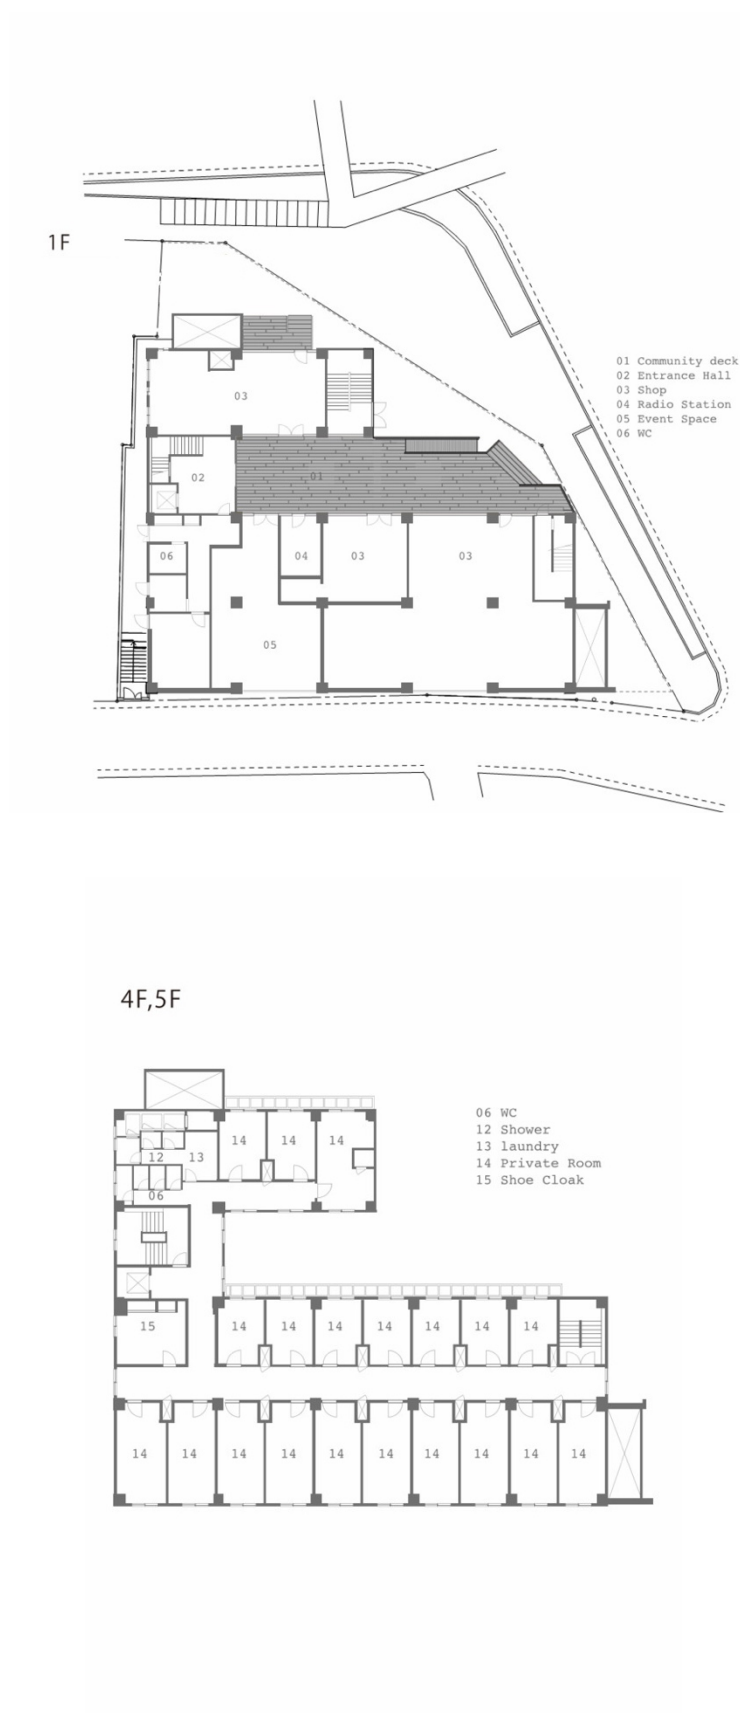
The Share Tokyo, 2012. Floorplans of the ground floor and the residential floors. Source: archdaily.com
